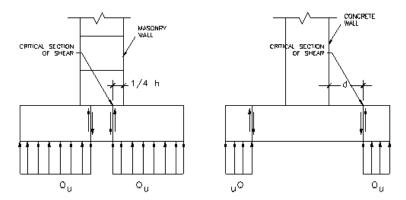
critical shear section of masonry wall footing and concrete wall footing.
